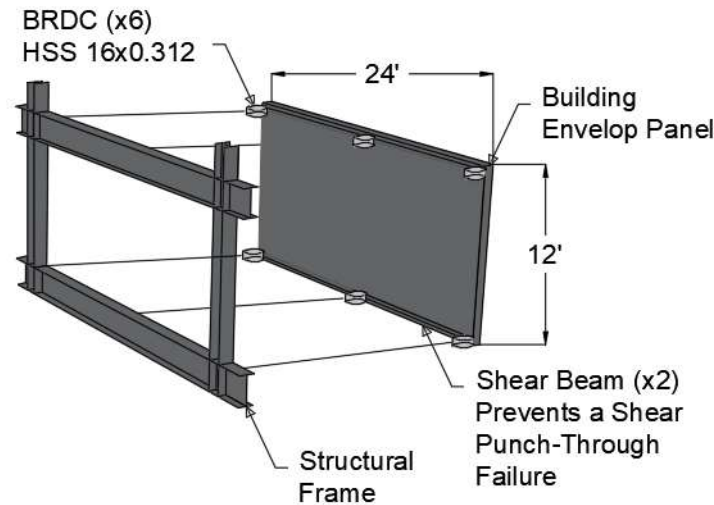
Implementation of BRDC to building envelope panel [7]
